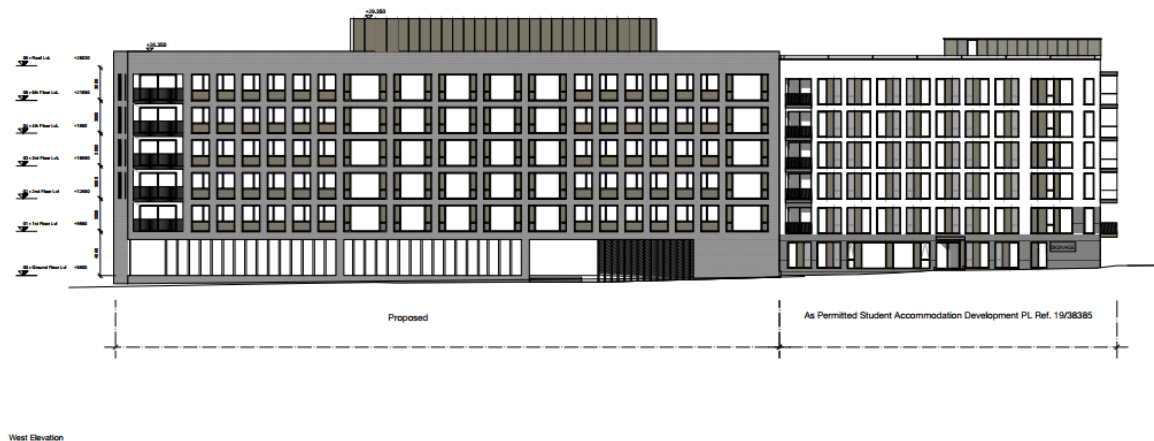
Proposed Development Site Elevation (Butler\Cammoranesi)
